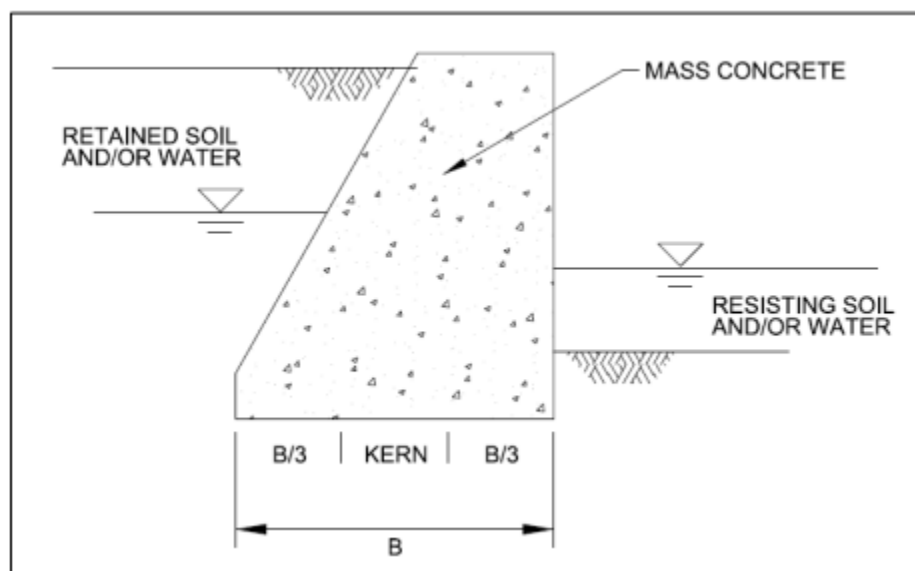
Typical Section of a Mass Concrete Gravity Wall
